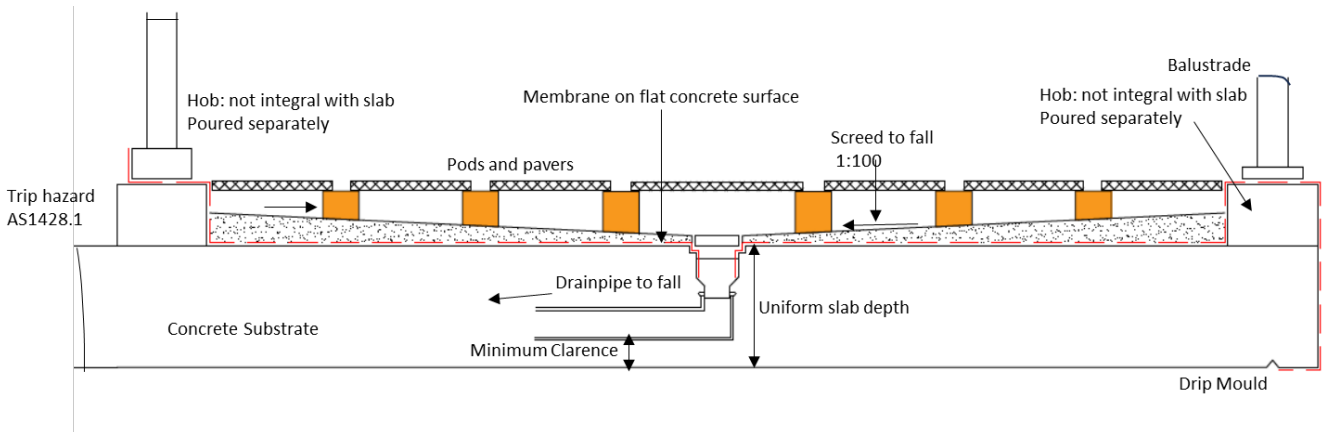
Preferred construction by builders (screed to falls with tiles/pavers and no set down)
